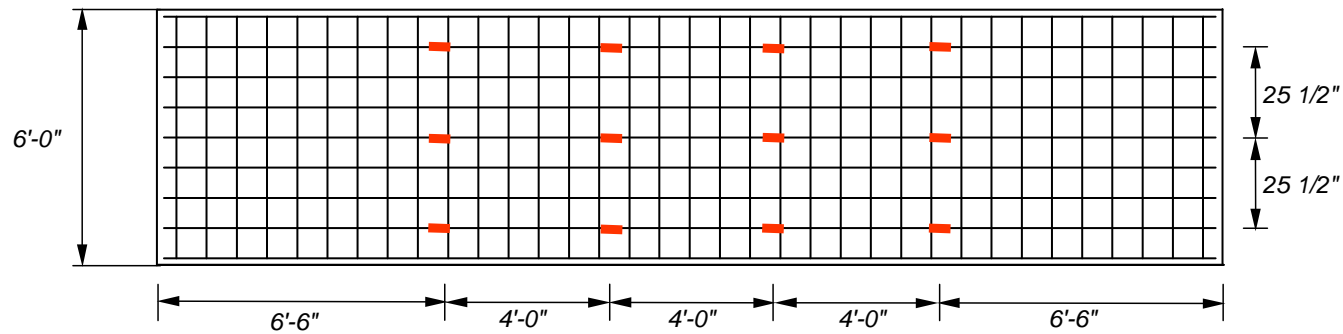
Position of Linear Potentiometers on East and West Sides and Location of Instrumented Sections in Flat-Slab Specimens
